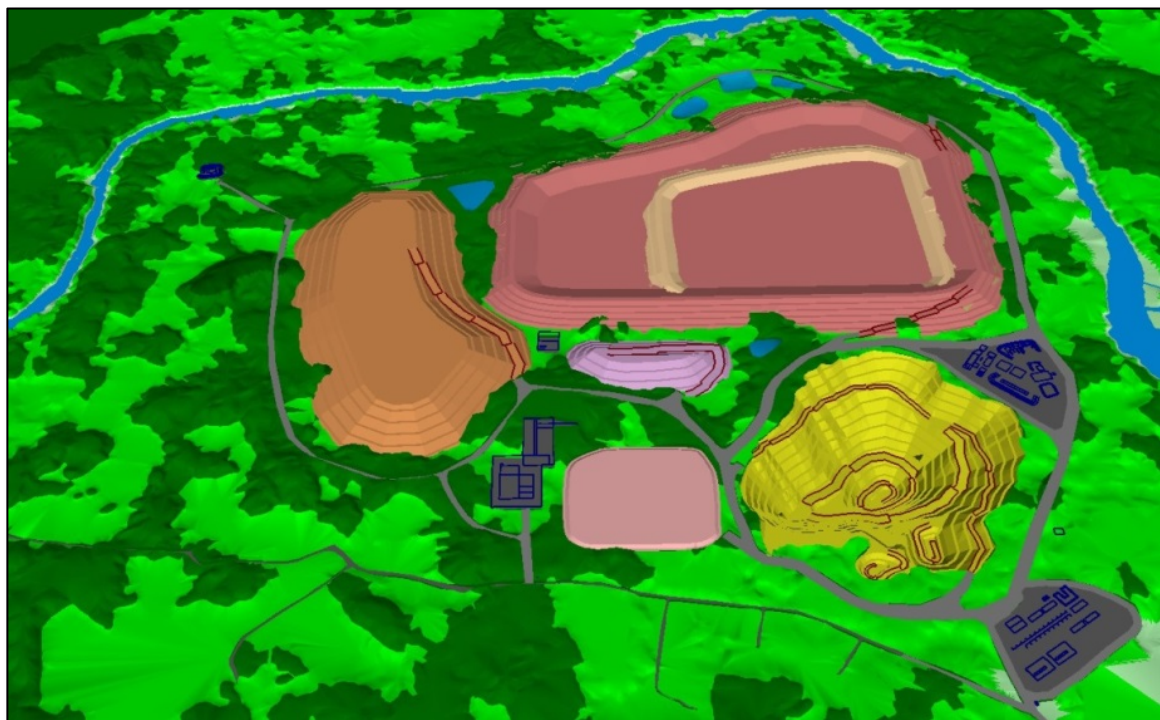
Jugan - Infrastructure Layout (3D)
